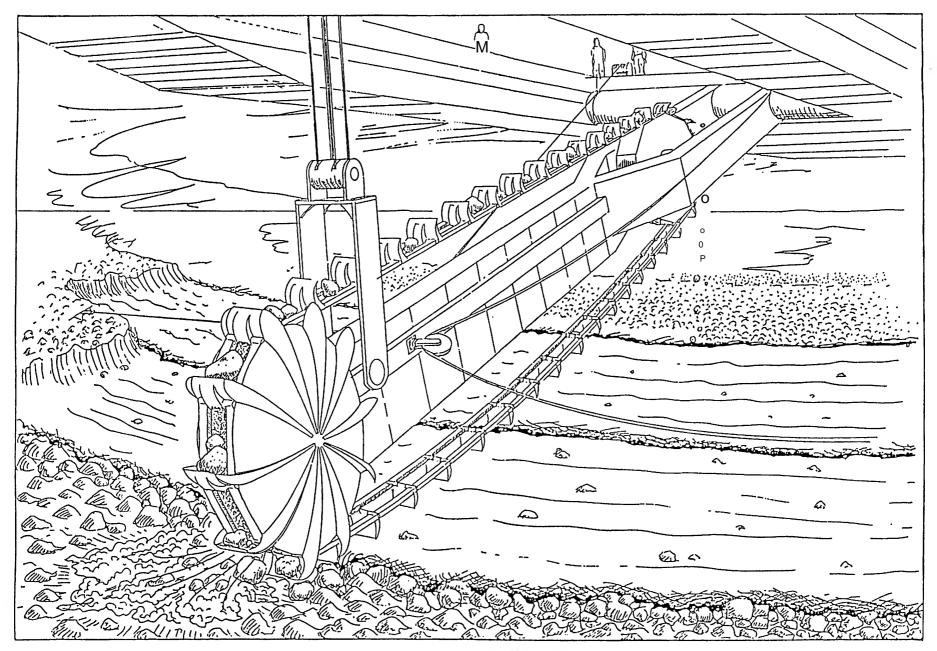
Prototype Cutter Chain/Wheel Dredge with Updated Ladder Chain and Polygonal Drive
